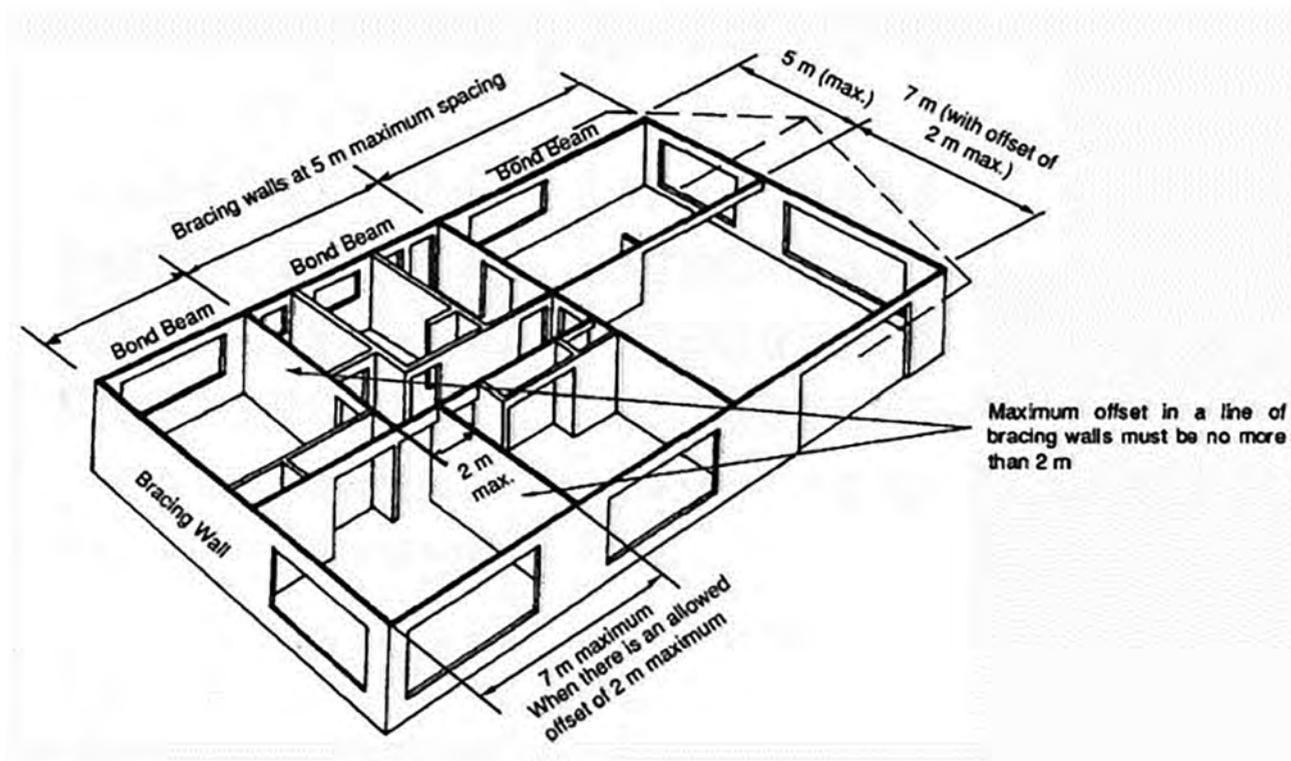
BRACING BEAMS AND BRACING WALLS
